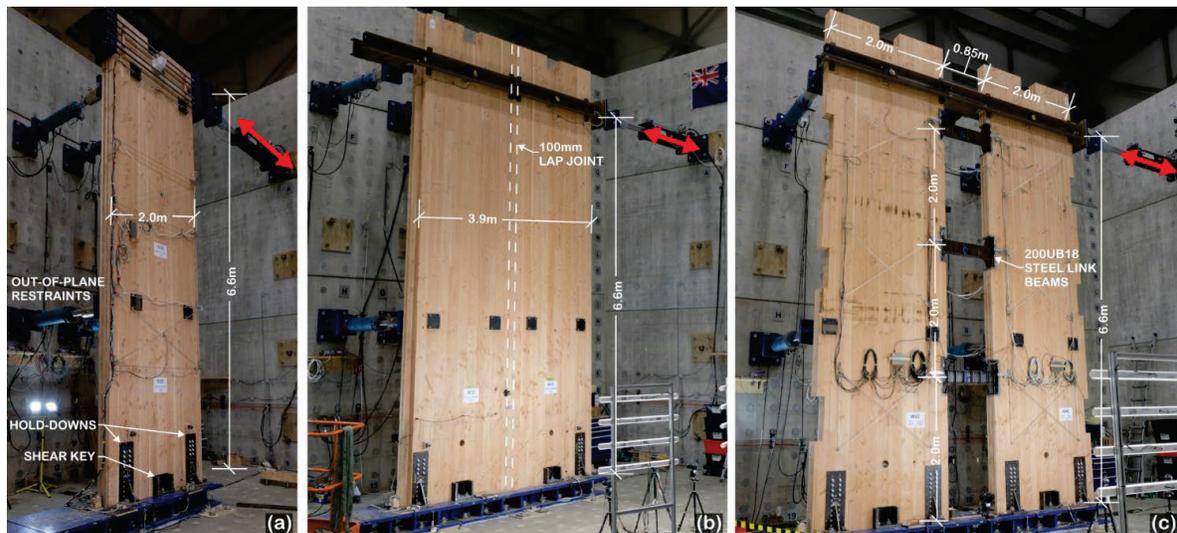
(a) Single wall, (b) coupled wall with a lap joint, and (c) coupled wall with steel link beams.
